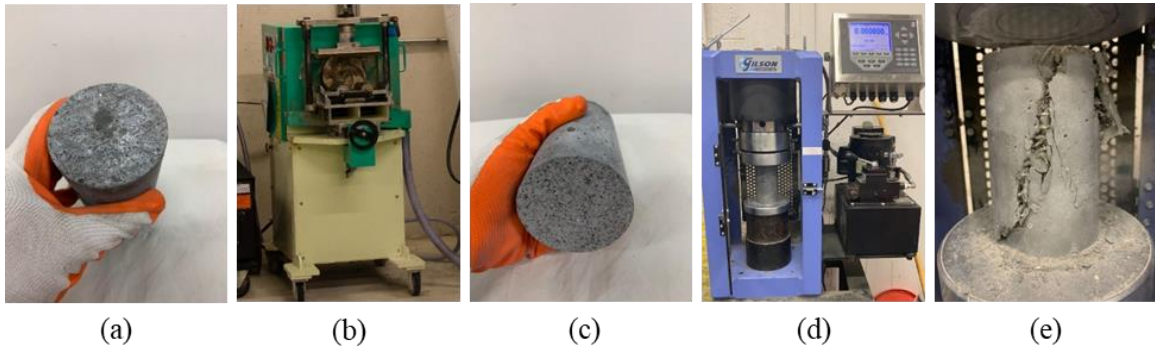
Compression testing procedure, (a) demolded sample, (b) grinding machine used to smooth each end of the cylinders, (c) sample after cylinder grinding, (d) compressive test machine with cylinder installed, and (e) diagonal break pattern of cylinder
